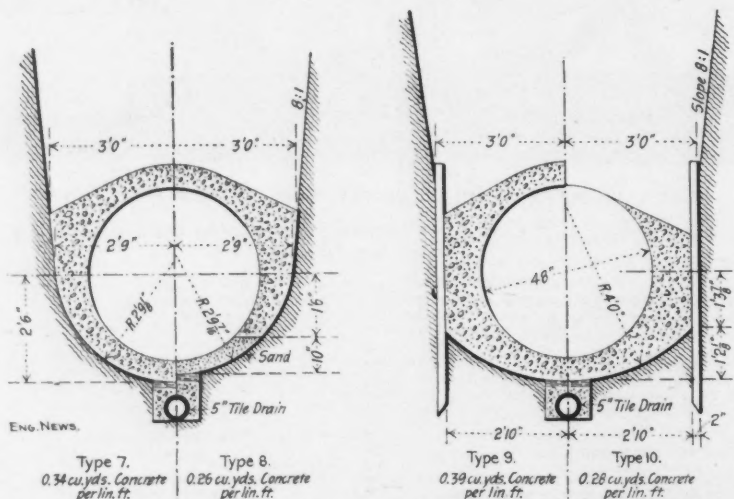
TYPICAL SECTIONS OF CONCRETE BACKING FOR 48-IN. STEEL PIPE.
